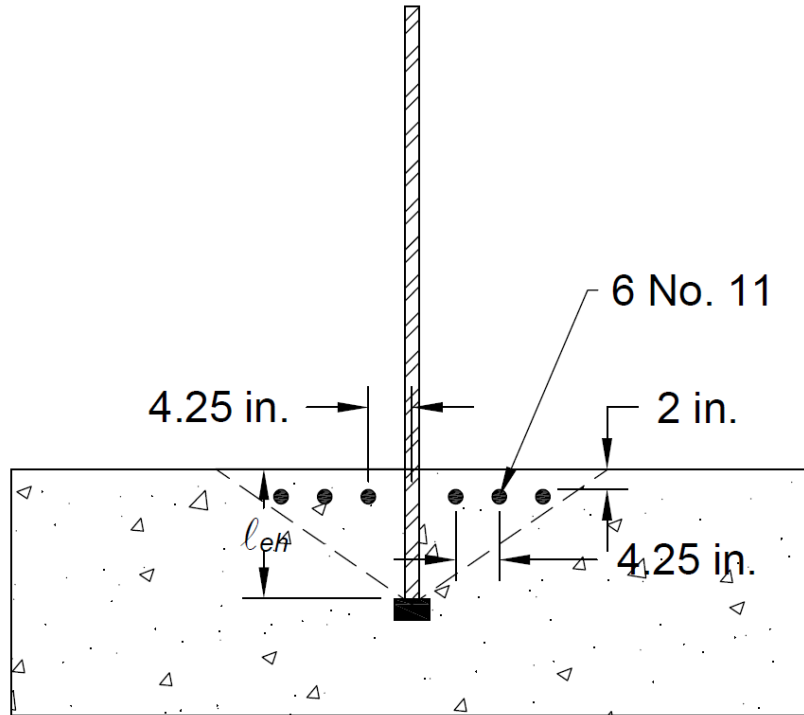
Cross-section view of slab specimen 11-5-S5.5-6#11-0-12.75 with no parallel ties
